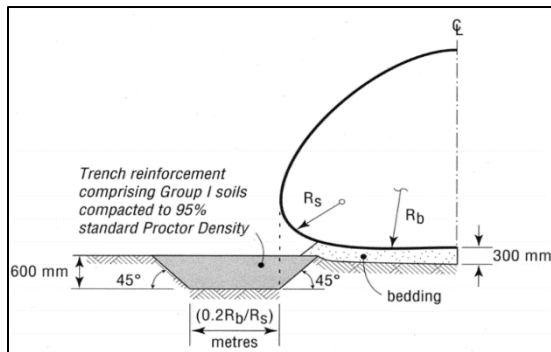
Illustration: Recommendations for constructing a reinforced side trench (Modified after HB V220, 2018)
